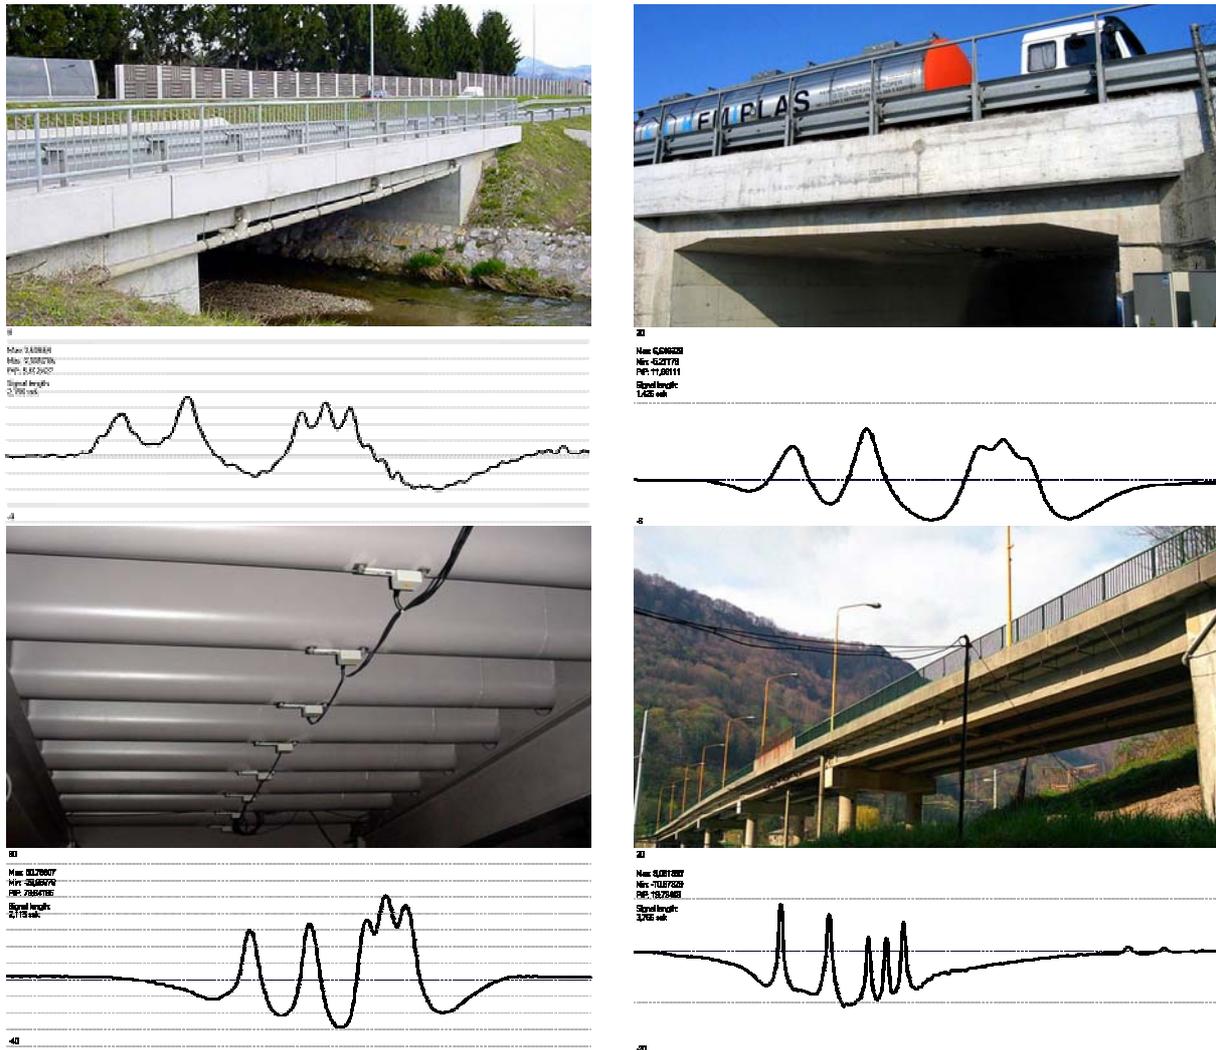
Clock-wise: Bridge with High Dynamics, Bridge with 0.8 m Thick Slab, Orthotropic-Deck Bridge, Beam-Deck Bridge Instrumented on the Slab between the Beams
